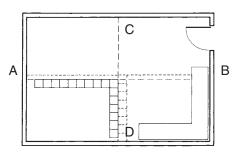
Adjust layout at center lines if less than one-half tile at walls.
